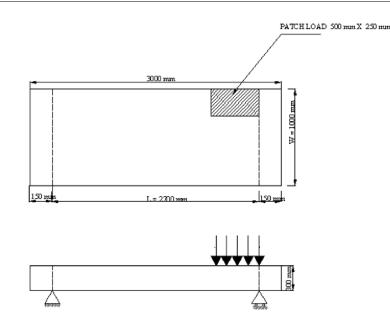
Position of patch load at corner of GFRP bridge deck panel
